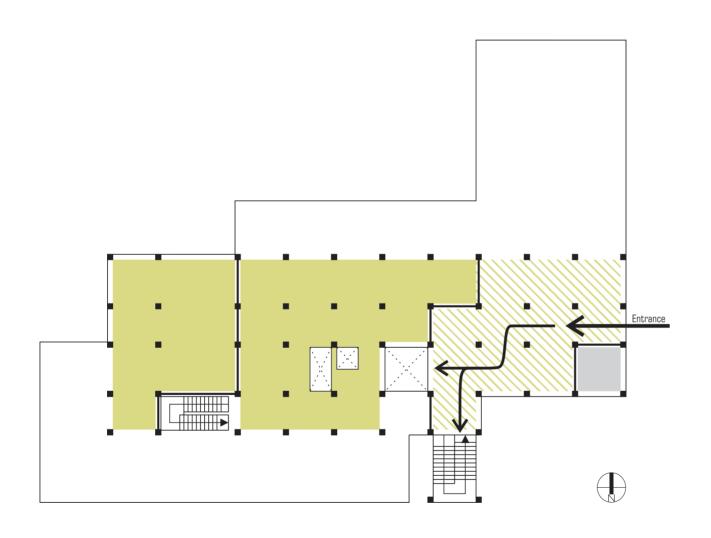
Diagram of existing ground floor layout indicating main circulation route from pedestrian access (by Author)
